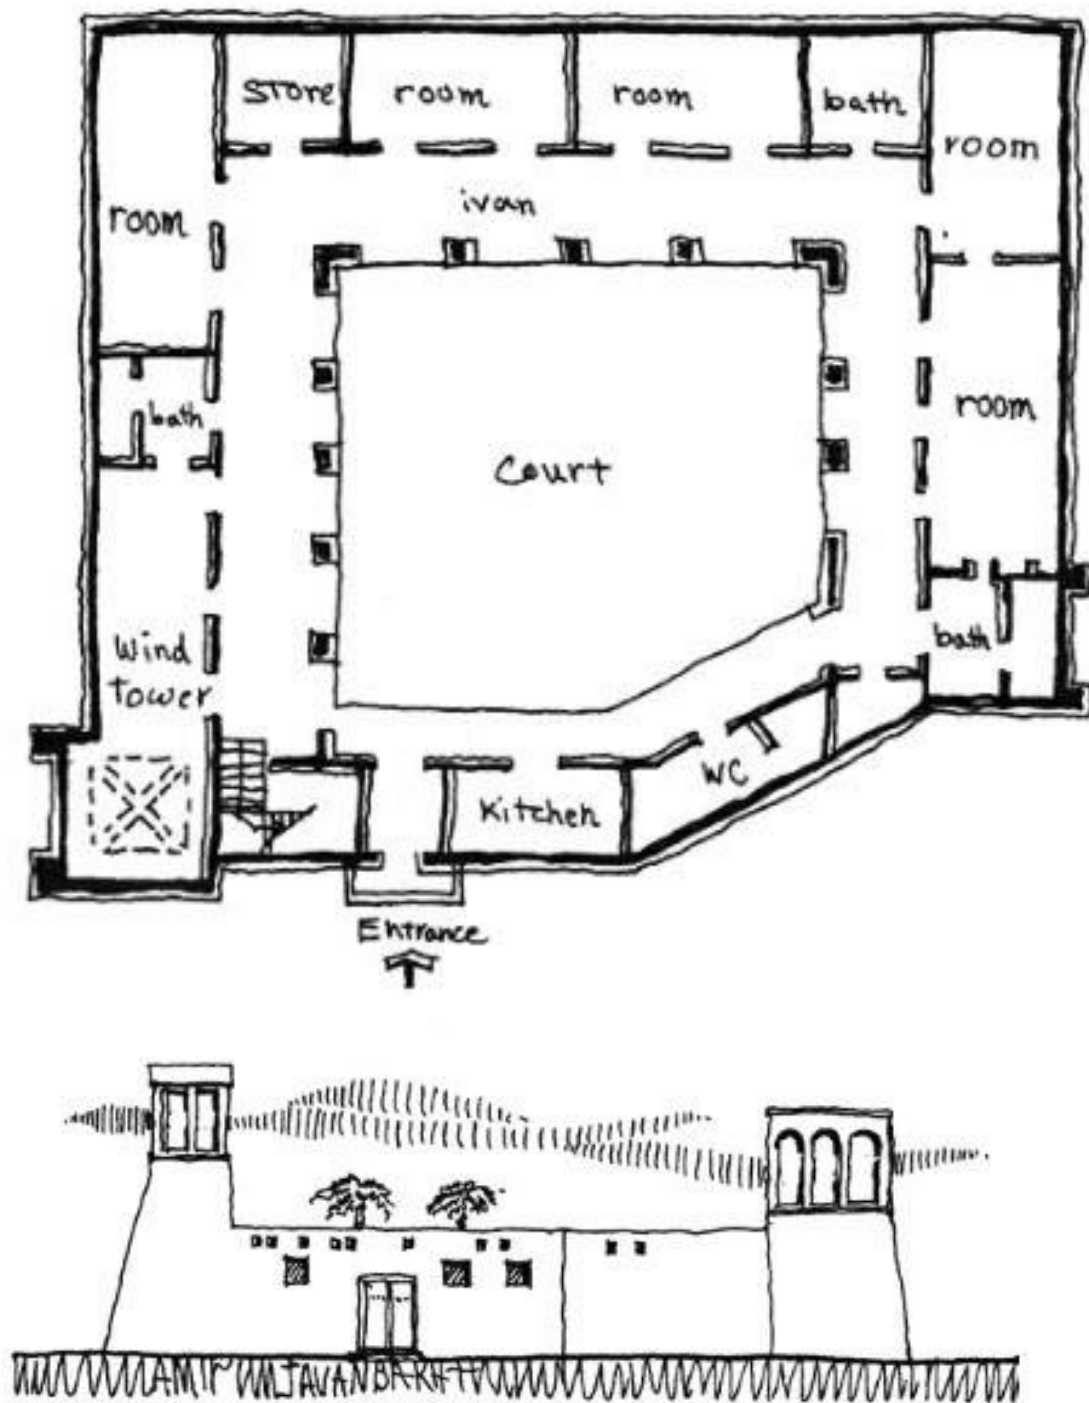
Elevations and plan of a courtyard house with a continuous colonnade around the courtyard in the traditional port city of Lenghe. (Bandar Lenghe Master Plan 1966,28)
